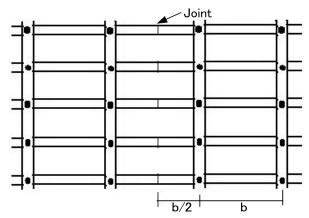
Sketches of composite with horizontal joints for earth slope protection
